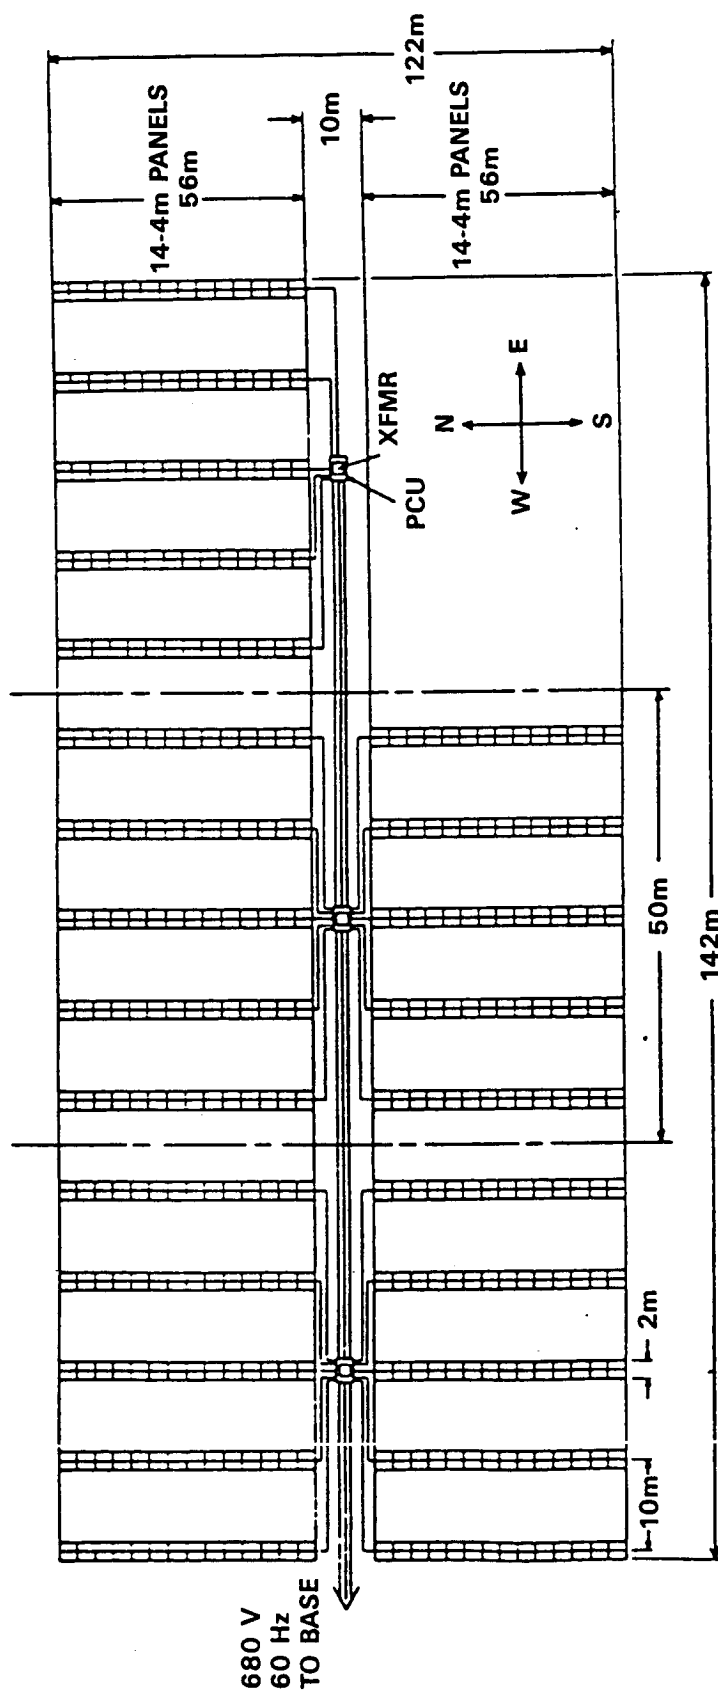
Plan View of 300 KW Solar Field After 5-60 KW Systems Have Been Assembled: Triangular Panel Arrangement
